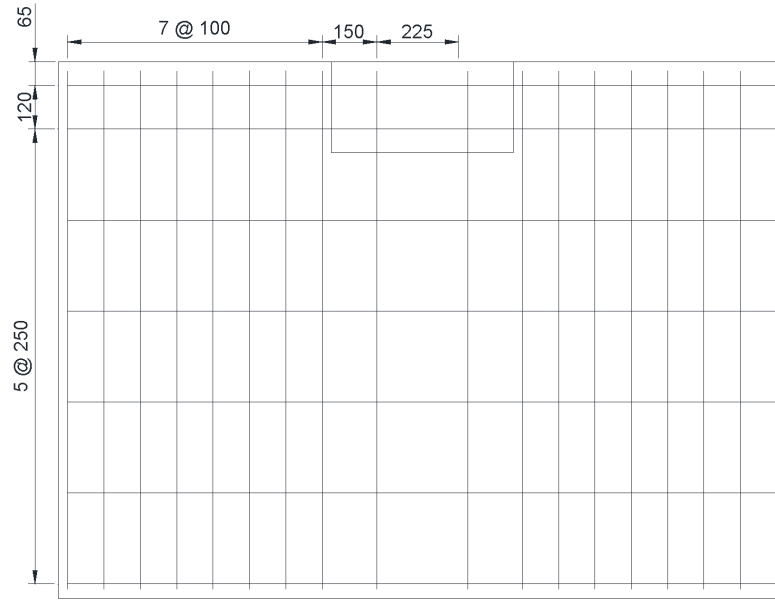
Bottom mat reinforcement details for Specimen 1 (10M bars) (units in mm)
